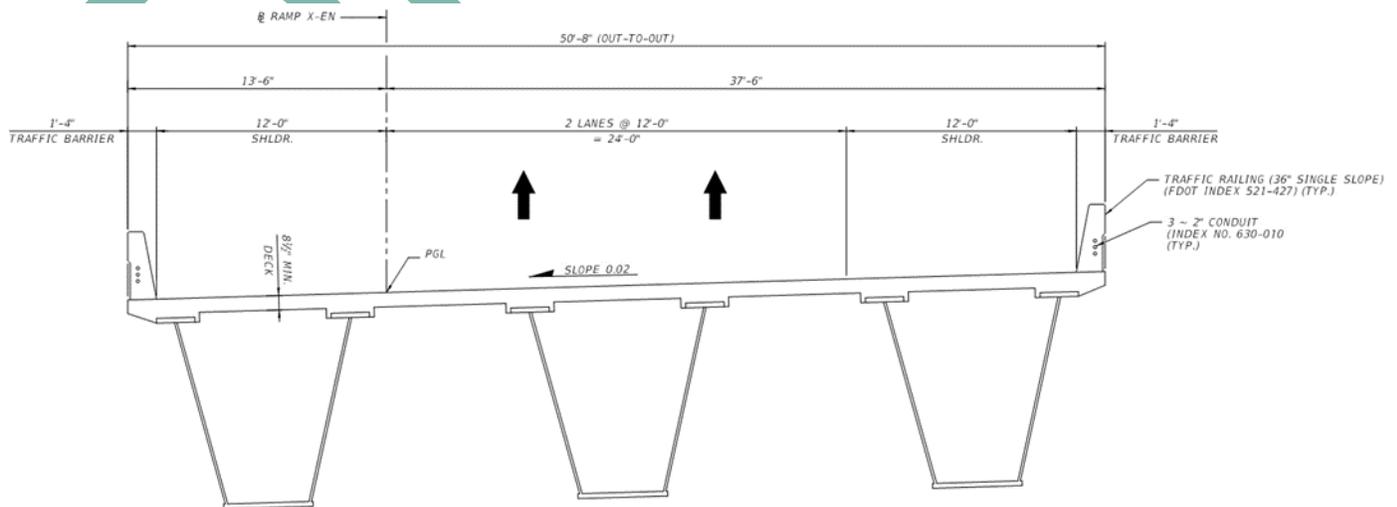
Bridge Typical Section (Bridge No. 9)
